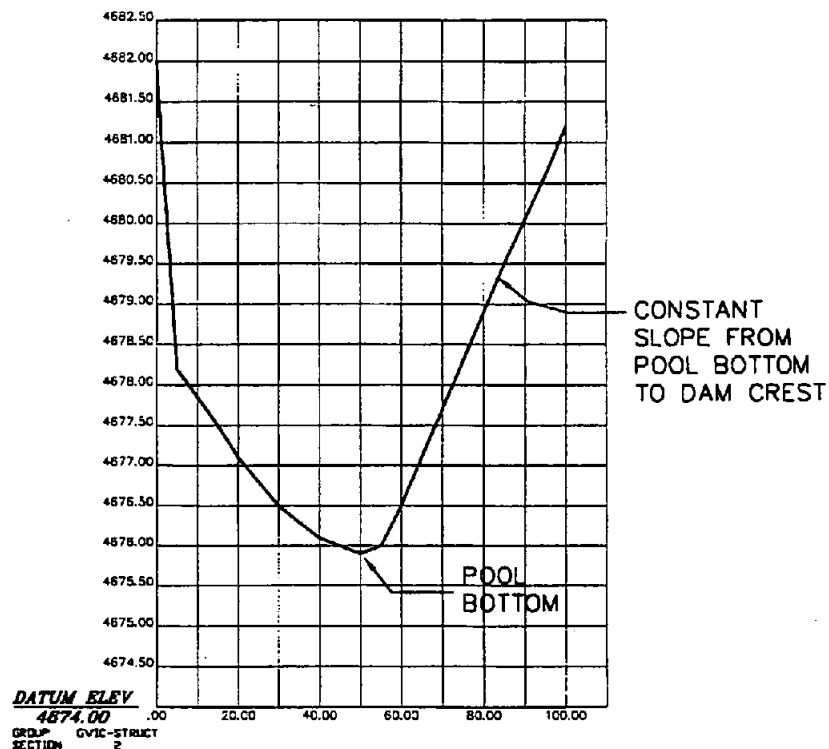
Pool section details (FLO Engineering, Inc., 1997).
